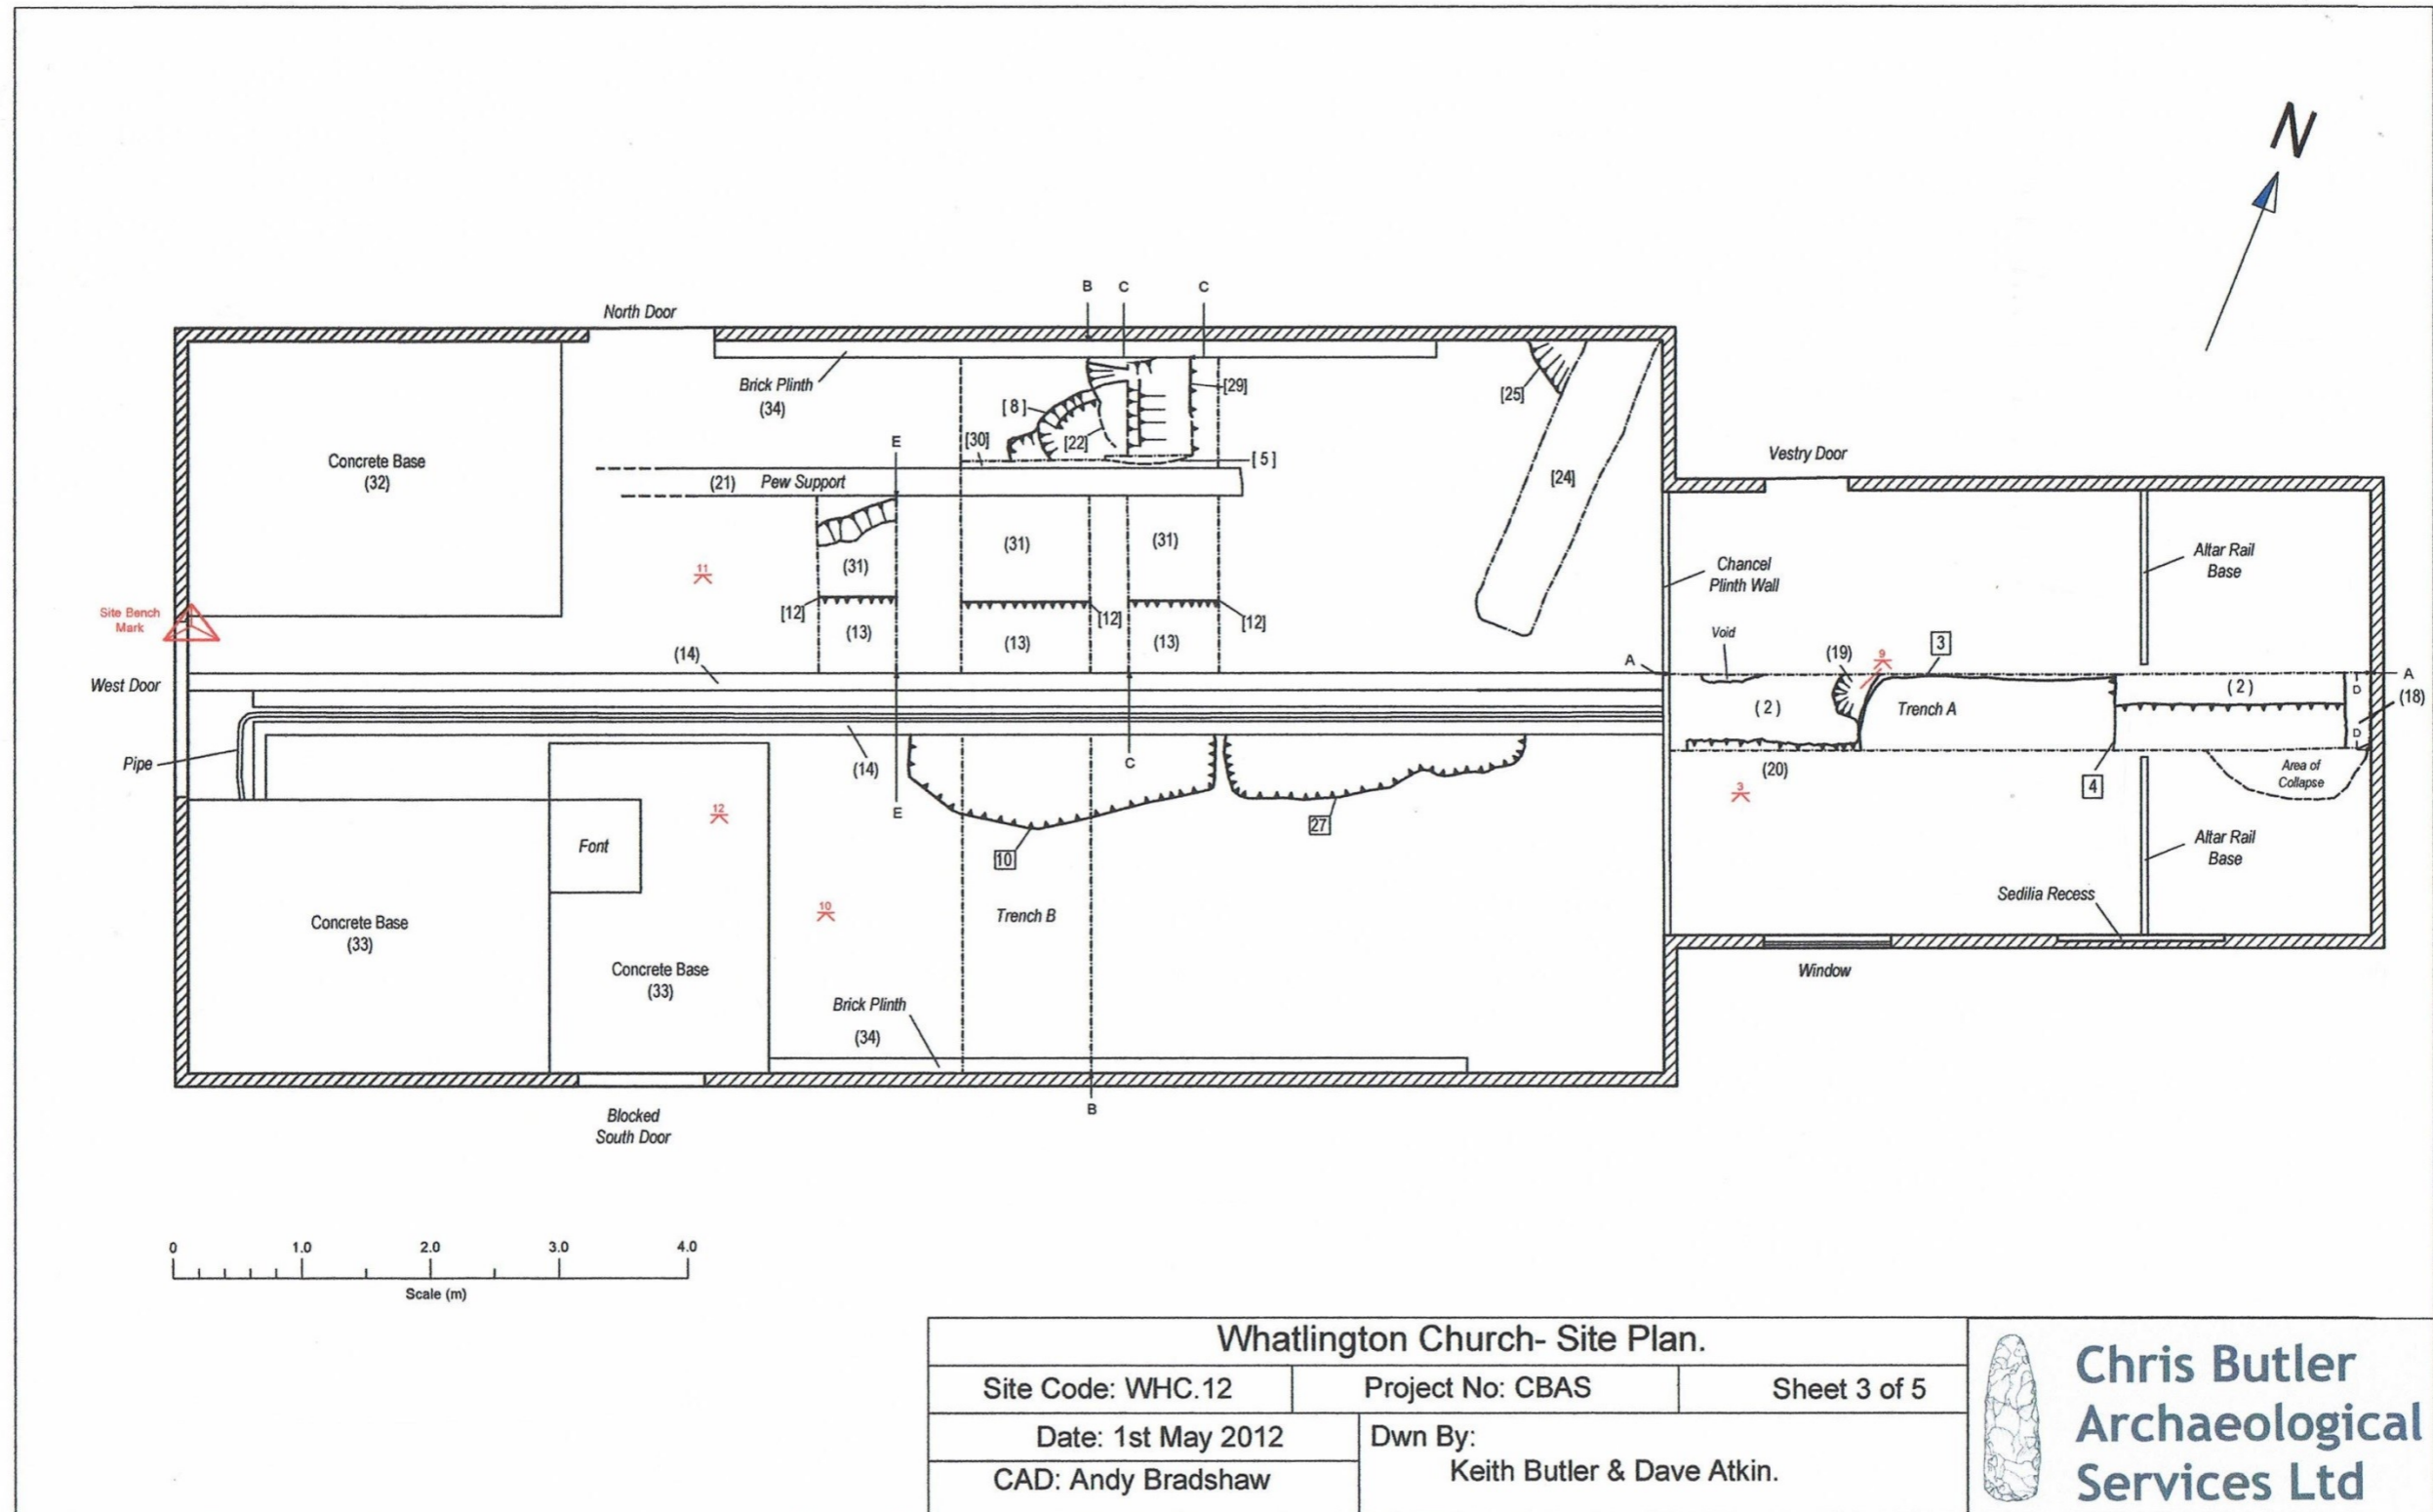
Whatlington Church: Site Plan showing all features and locations of sections
